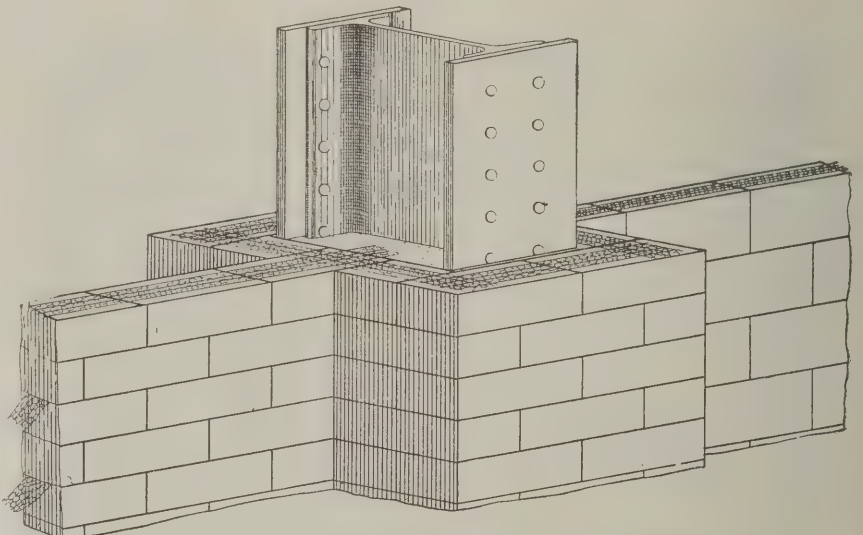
REINFORCED BRICKWORK IN CONNECTION WITH STEEL WORK.
